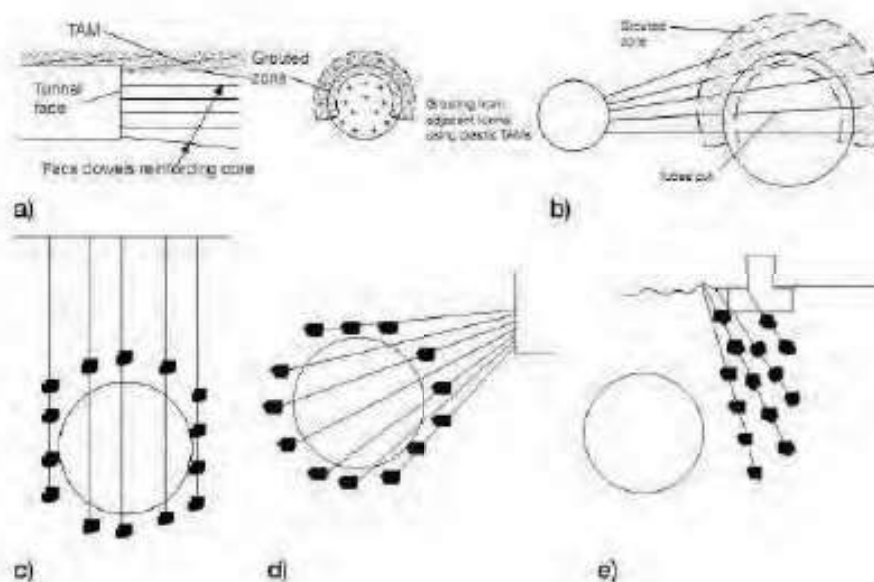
Examples of grouting tunnels during construction, a) from within a tunnel, b) using an adjacent tunnel [60], c) from the ground surface, d) from an adjacent shaft, or e) as protection to adjacent structures (Baker, 1982)
